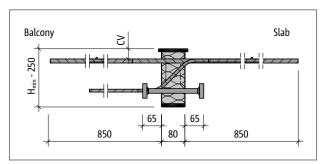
Schöck Isokorb® T type K-M12: Product section
